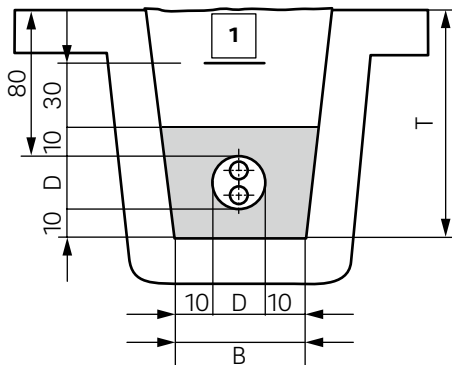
Trench cross-section of RAUPIPEX pipe
